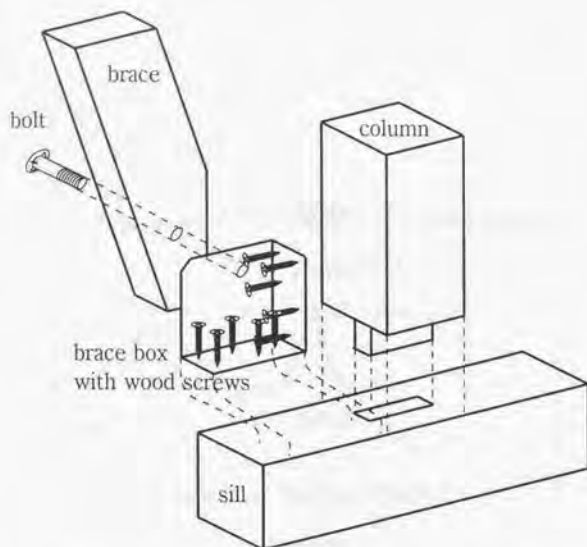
2. 3. Details of joint of brace, column, and sill.
